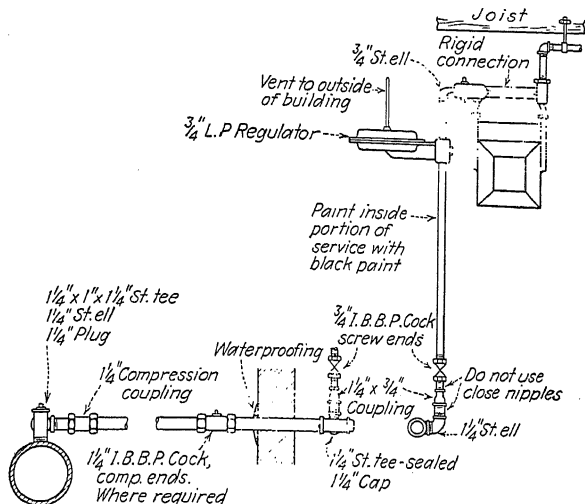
Sketch of steel gas service using compression couplings with threaded packing nuts.
